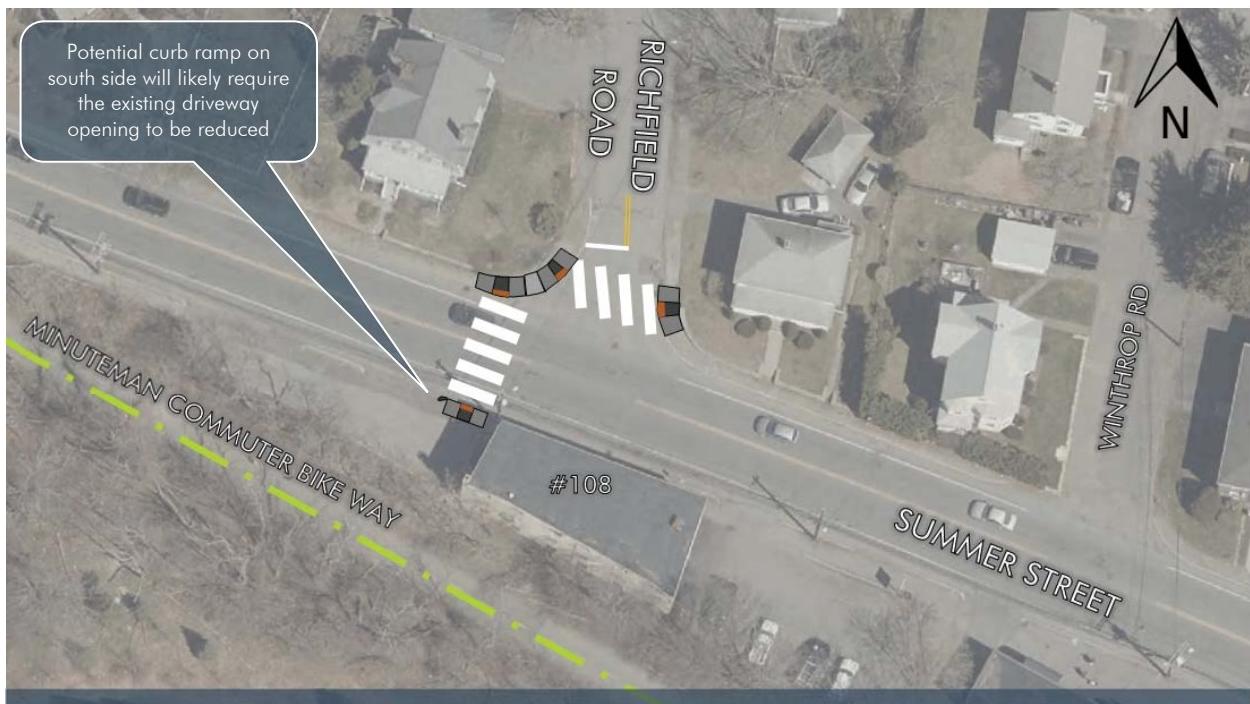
Potential Crosswalk at the Summer Street & Richfield Road intersection
